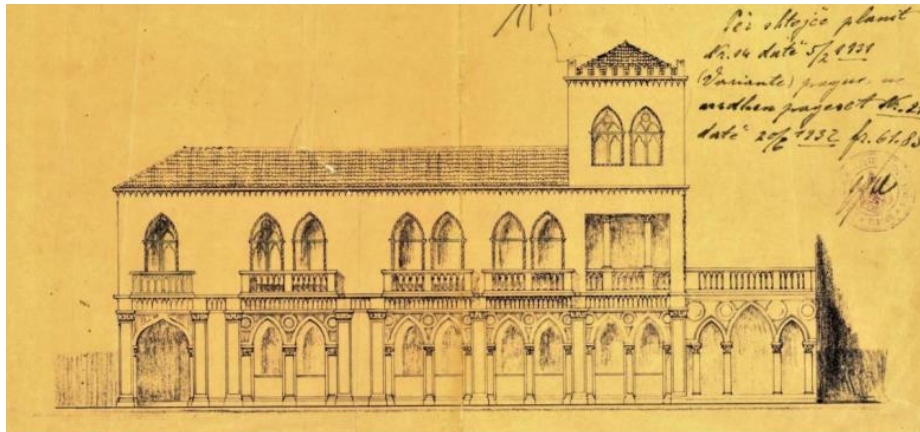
Facade of the original project of the villa (source: National Building Archive)
